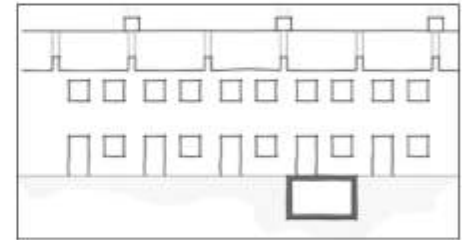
Typical terrace of houses with retrofit basement introduced beneath one house
